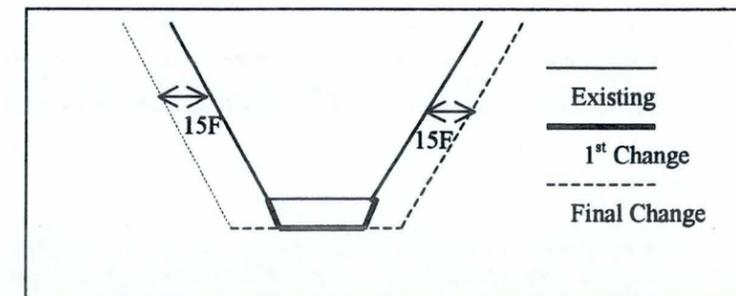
Channel Bottom Width Extension in Alternative 4 from cross section 17.071 to 18.193.
